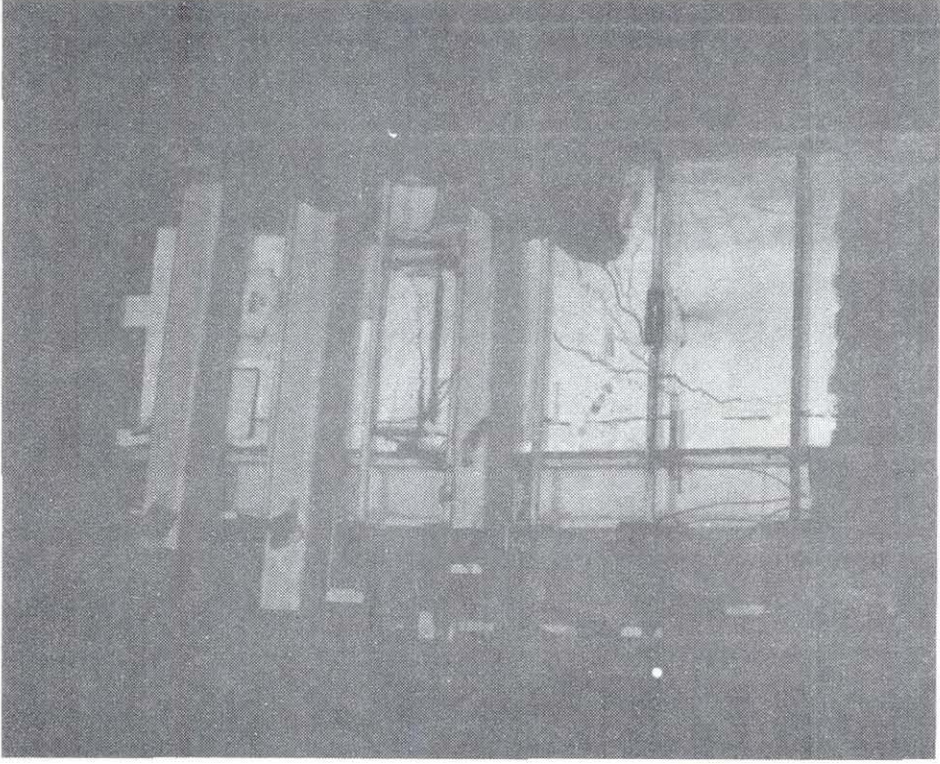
Bent 45, west column. Shear key horizontal crack under last (4000 kip) load cycle.
